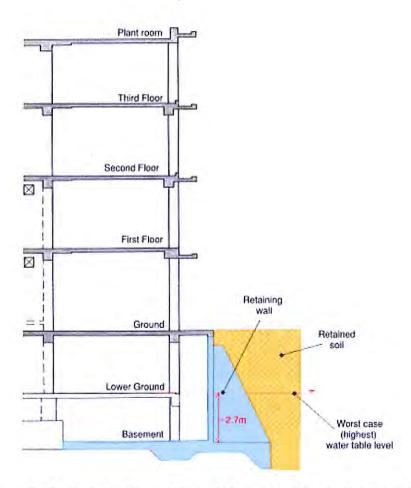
Parkside Block A Partial Elevation showing Retaining Walls
